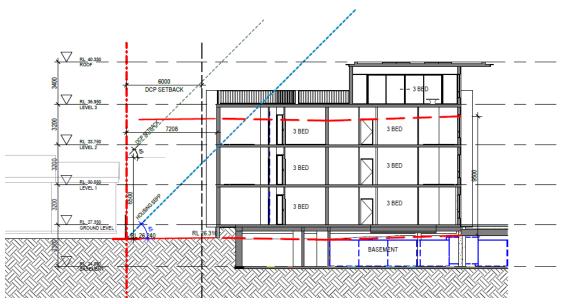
Section of Building showing Housing SEPP building envelope plane in blue from rear boundary (Source: Group GSA)
